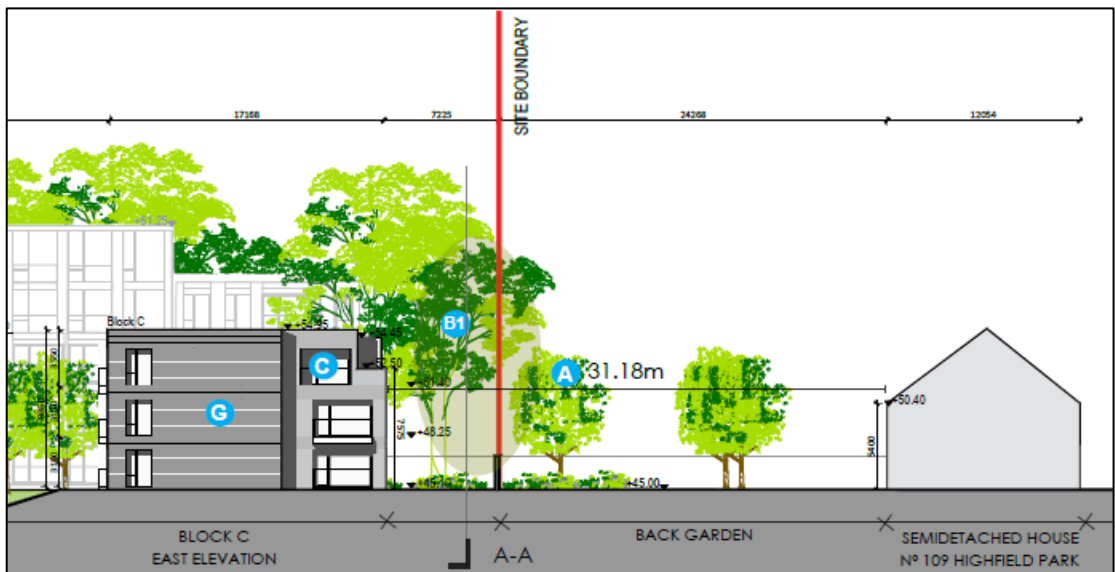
Example of Measures Proposed to Reduce Potential Overlooking Along Site Boundaries (Source: Extract from Section 5.8 – OMP Architectural Design Statement).
